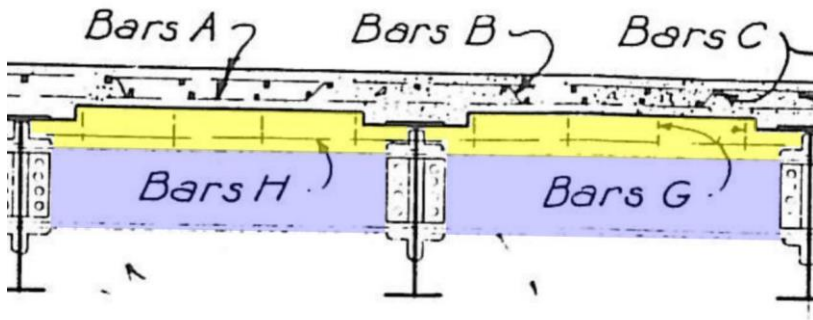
Elevation view of typical diaphragm detailing, with concrete and typical reinforcing highlighted in yellow and steel diaphragms shaded in blue.
